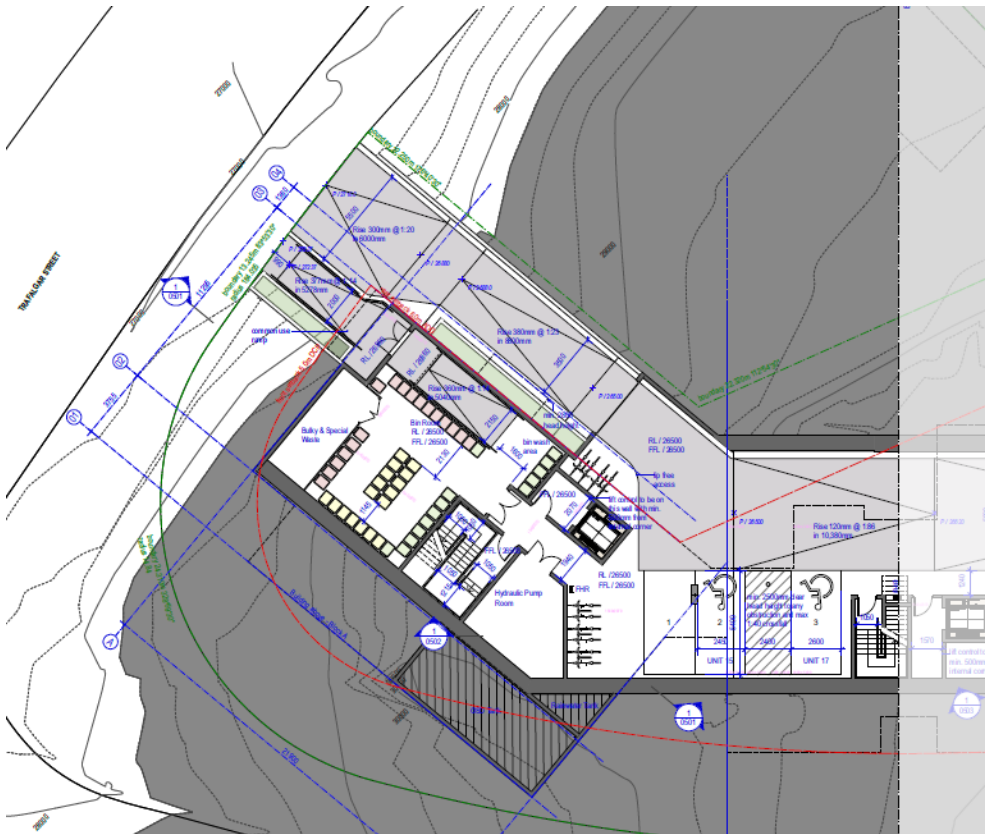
Extract from Architectural Plans – Level 00 - Part 1 (Source: Architectural Plans, Kennedy Associates Architects, dated 29/08/2024)
